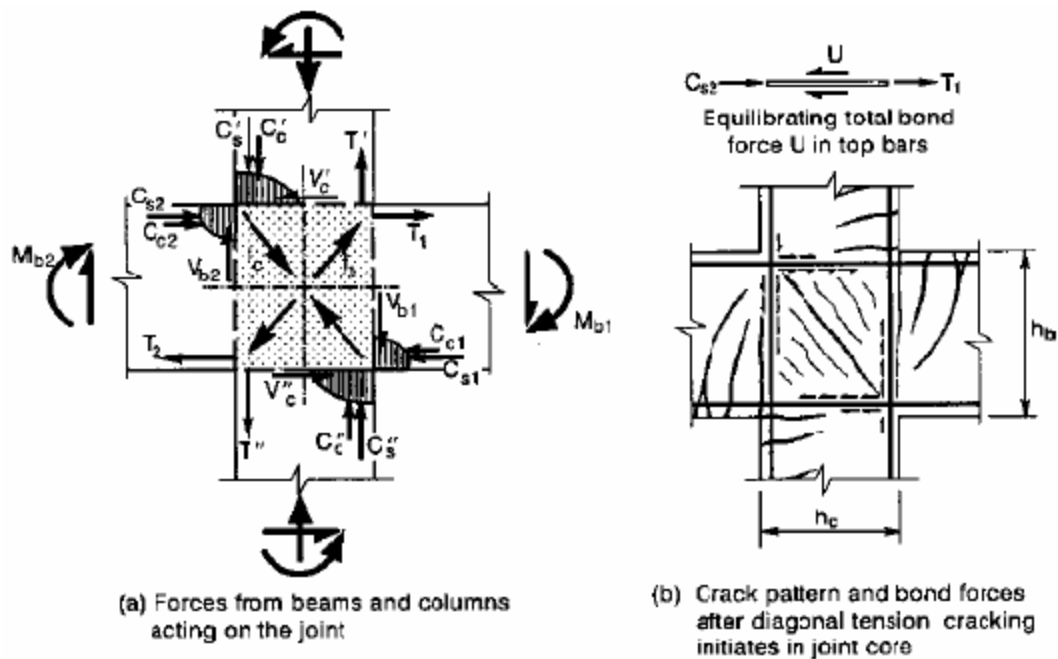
Force acting on a reinforced concrete interior beam-column joint during an earthquake.
